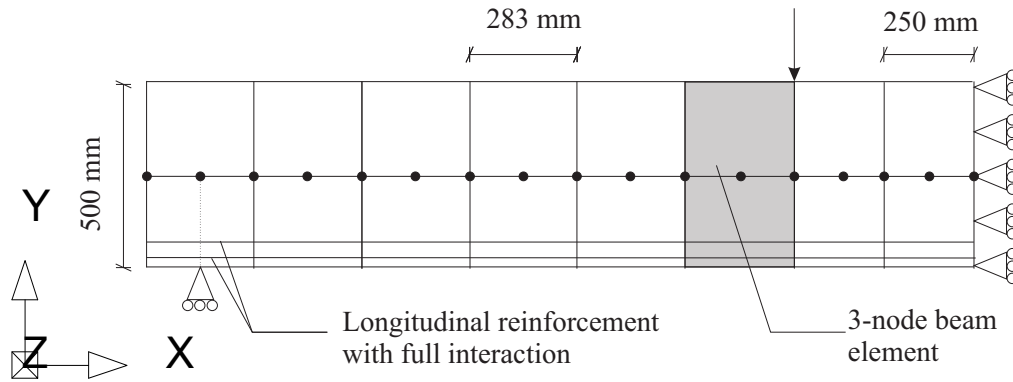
Overall view of the finite element mesh used for beam-element analysis of a beam affected by frost damage.
